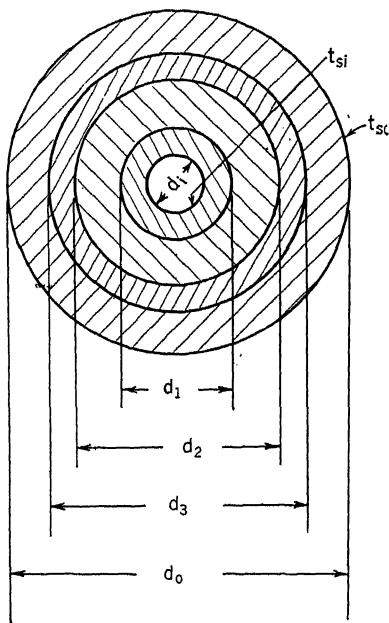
Cross section through pipe insulation, multilayer wall.
